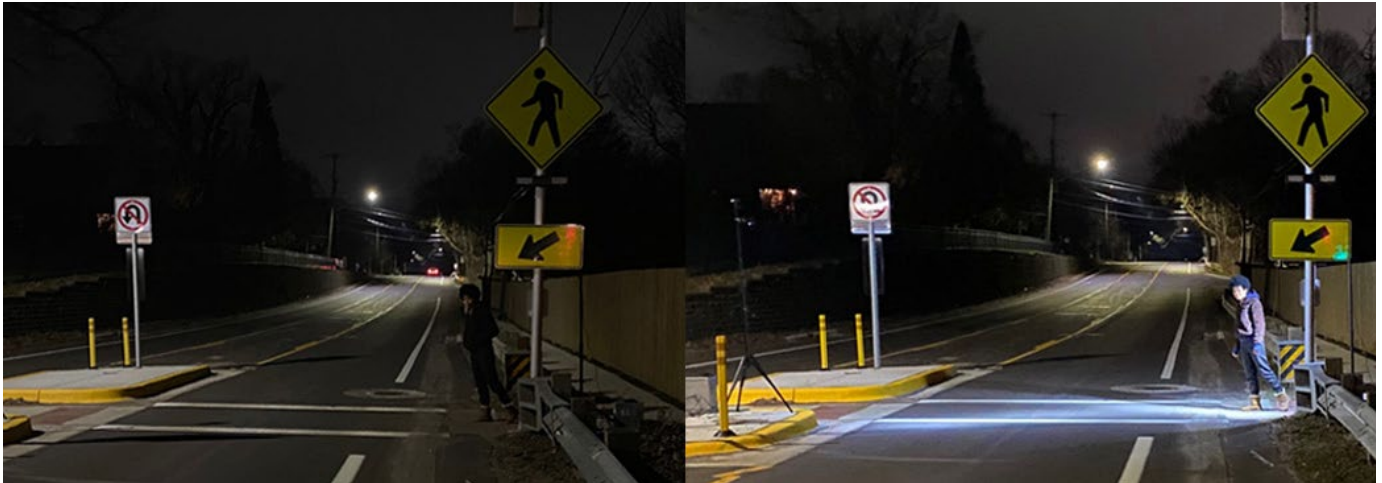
Photograph. Midblock crosswalk with (right) and without (left) crosswalk illuminators.
